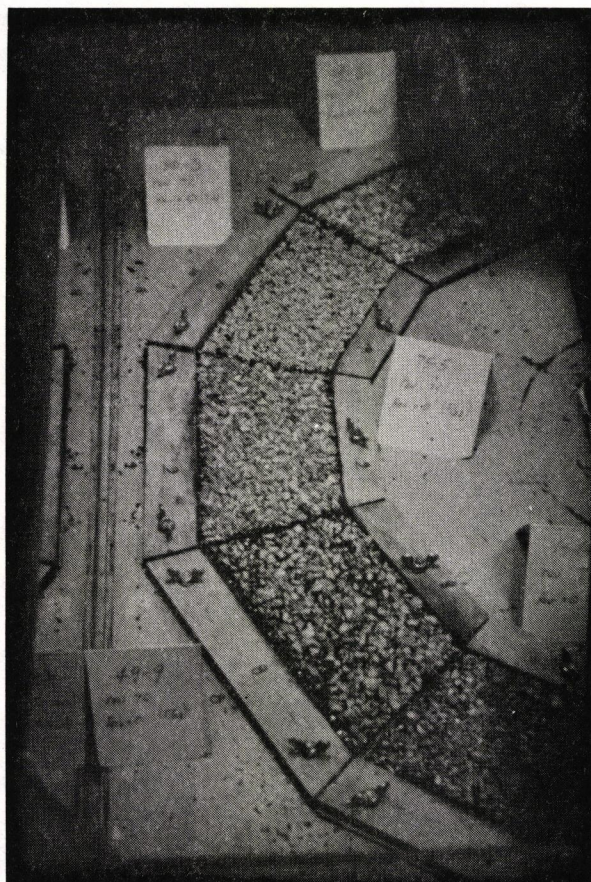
Seal Coat Specimens Attached to AWD Track, Ready for Testing
